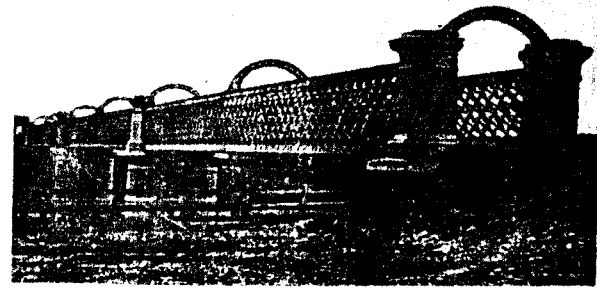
Typical examples of british bridge technology, lattice girders (for road and rail), and the plate web girder. Braced cylindrical piers were preferred and the plated diaphragms minimised the trapping of flood debris.
